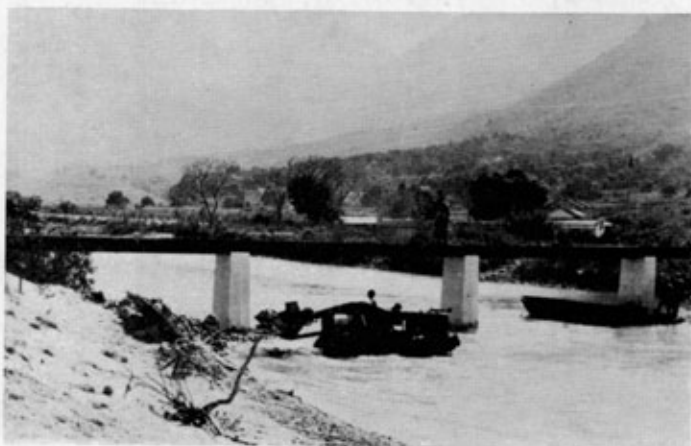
Tung Chung Footbridge nearing completion. Light wheeled tractor clearing river bed and in-filling round pier foundations.
